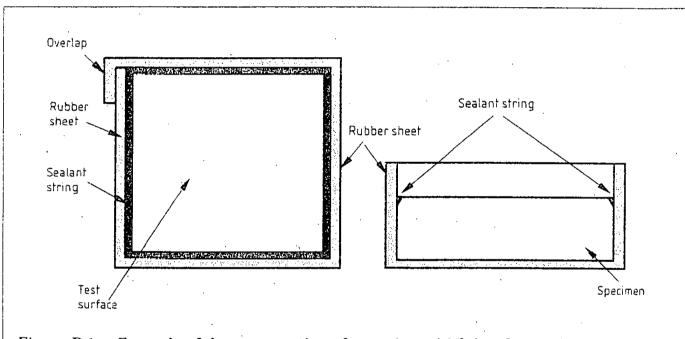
Example of the cross-section of a specimen (right) and a specimen seen from above (left)
